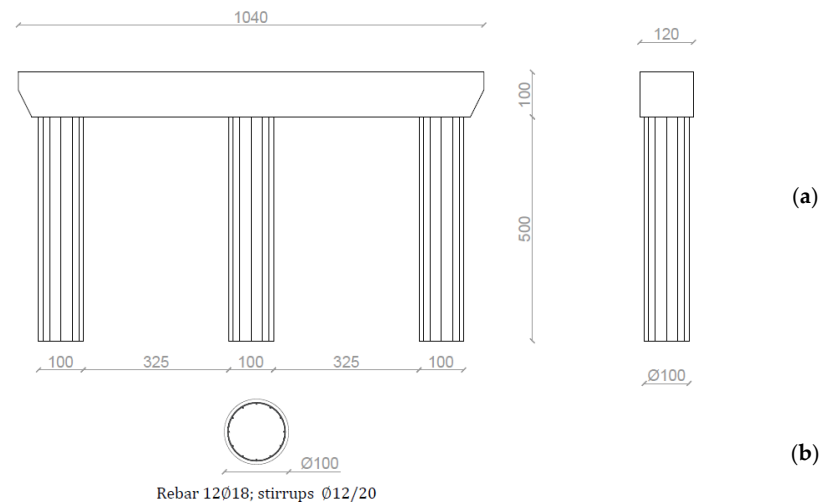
Frame pier: (a) elevation view; (b) cross-section with details of the reinforcement. Dimensions in cm.
